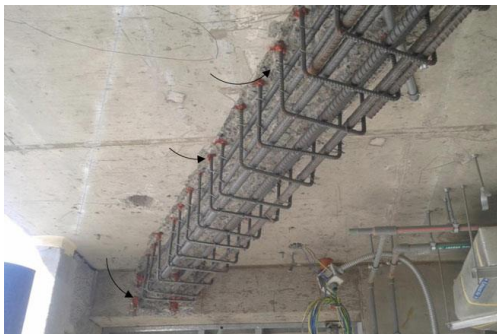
Slab strengthening by adding concrete beam [Abdelrahman 2023]
